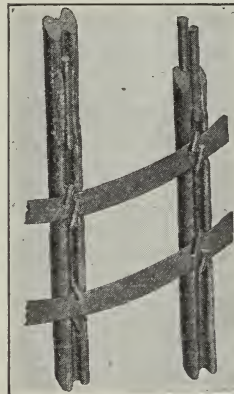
The Golding Bar System of Concrete Column Reinforcement.
